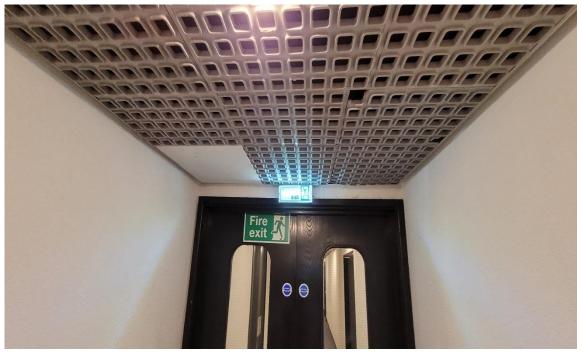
Typical plywood sheeting to 5<sup>th</sup> floor lift lobby ceiling where ceiling tiles missing
